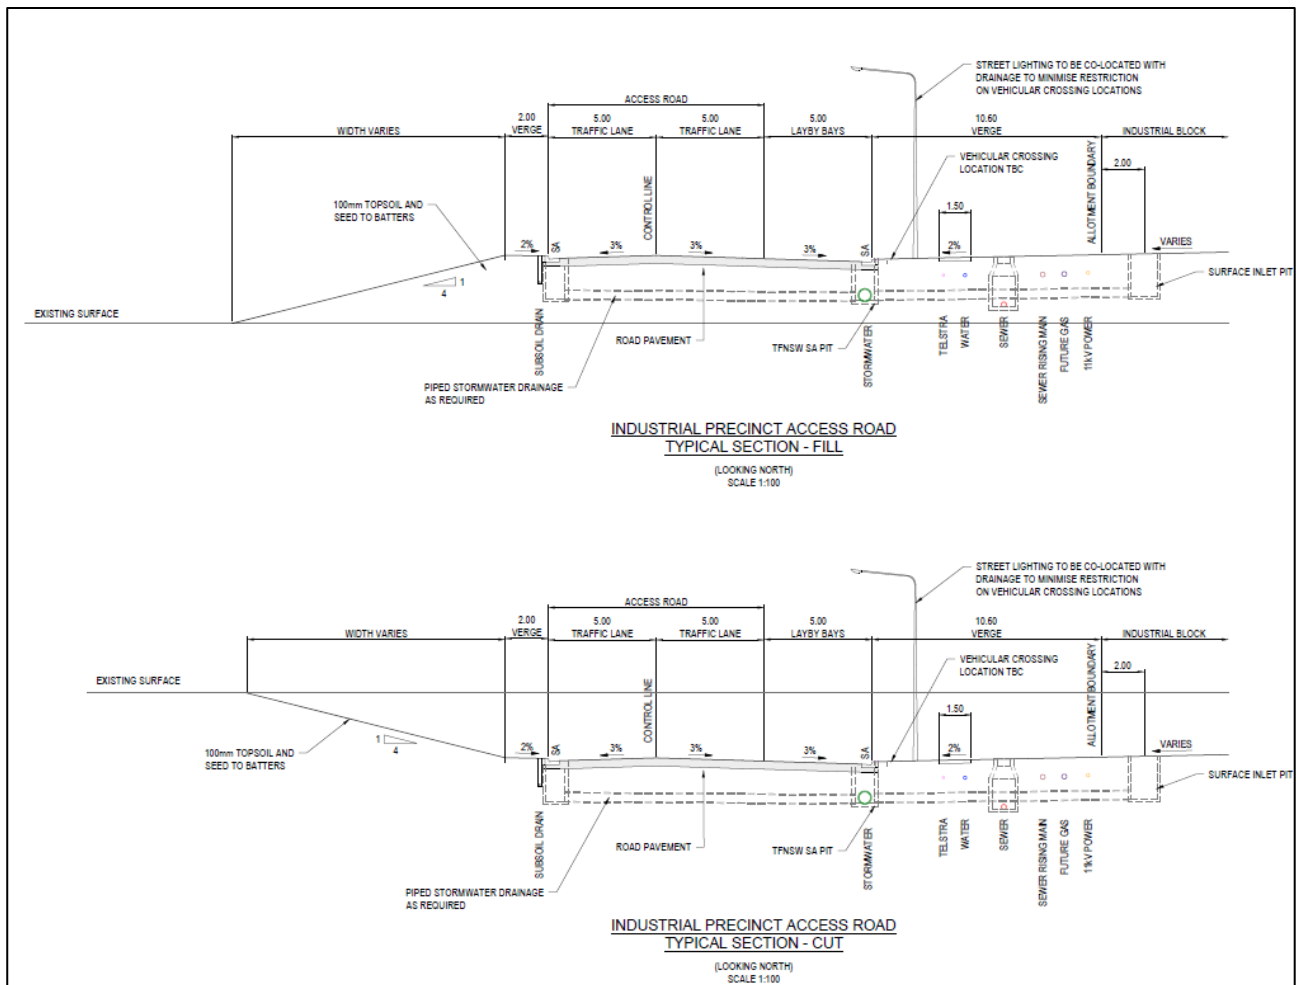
Proposed cross sections for Road No. 1 (Source: Calibre, 2021)
